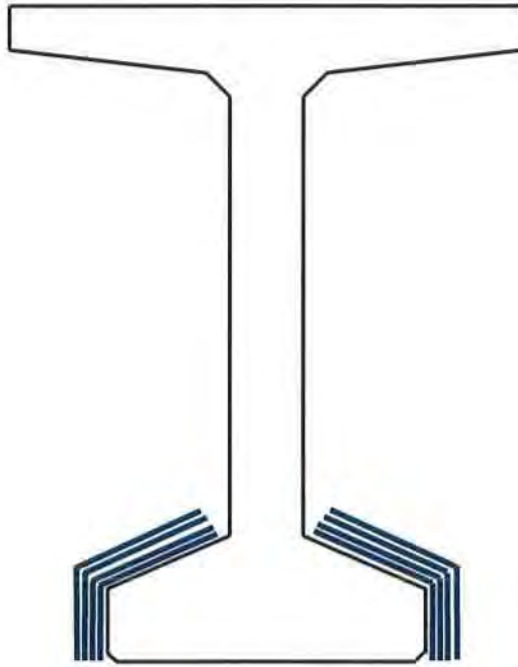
Detail of the Cross-sectional FRP Configuration at Section B
